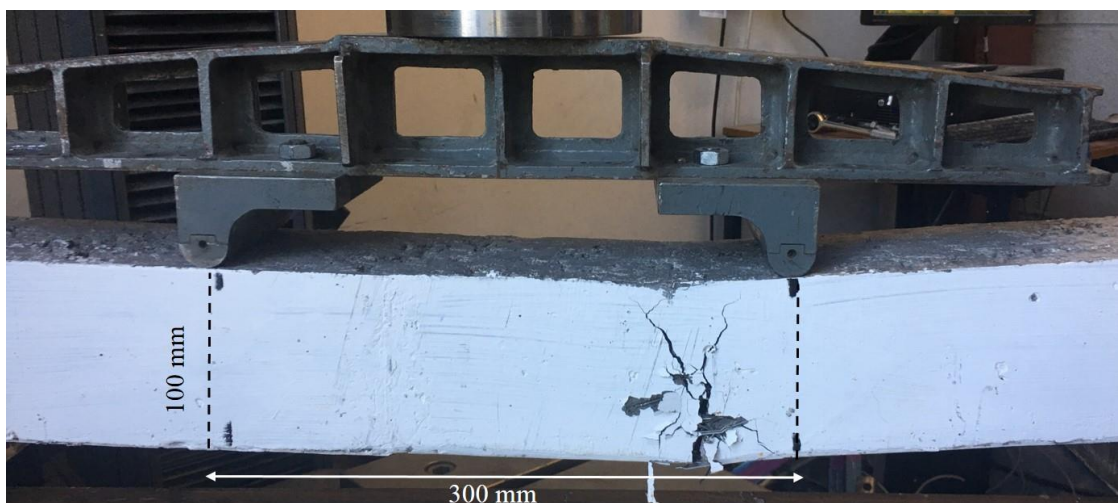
Crack and failure of the concrete beam reinforced with aligned steel fibres
